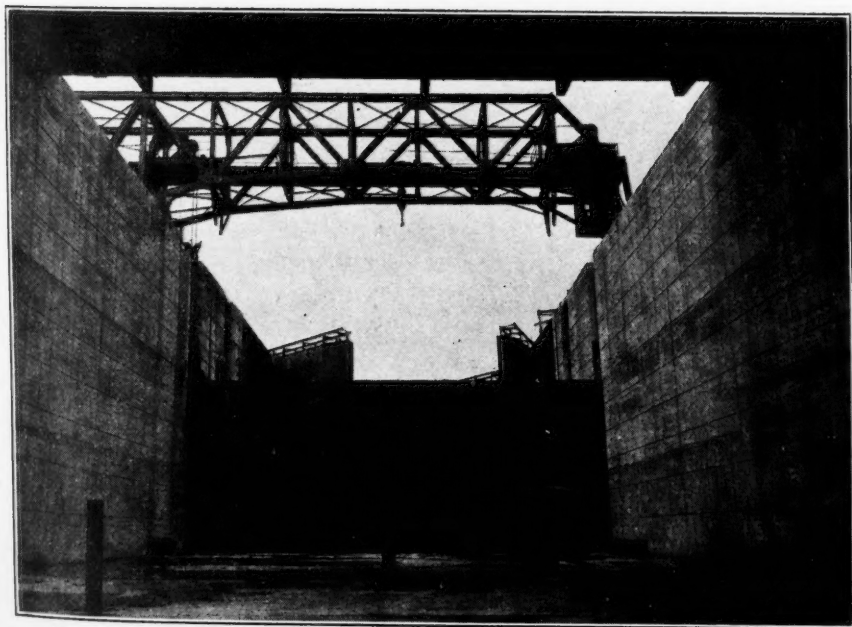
VIEW OF EMERGENCY DAM AND SWING SPAN FROM LOCK FLOOR BELOW.
